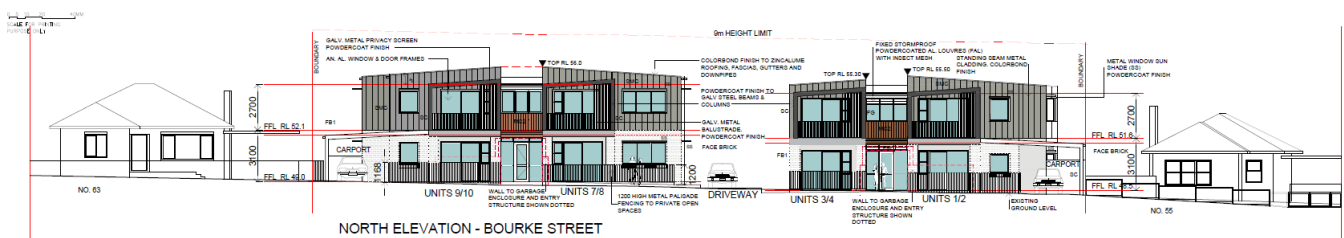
Bourke Street (North) Elevation (Source: Barry Rush & Associates Pty)
